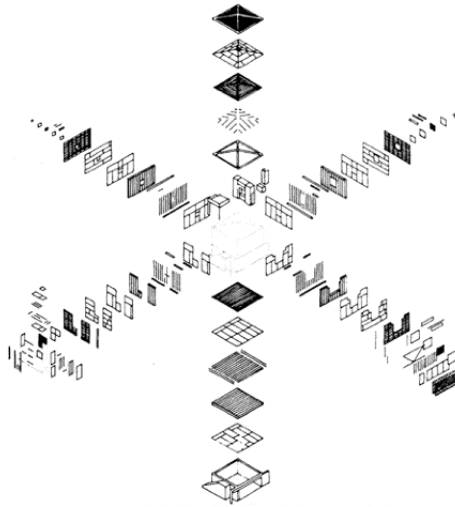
Exploded drawing by Thom Mayne and Michael Rotundi of Morphosis.
